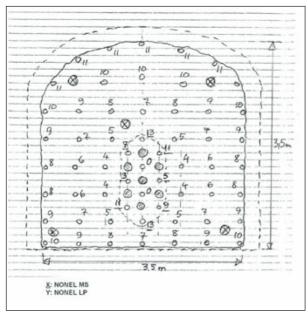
Final ignition plan for underwater piercing blast round. (Illustration: Dyno Nobel)
